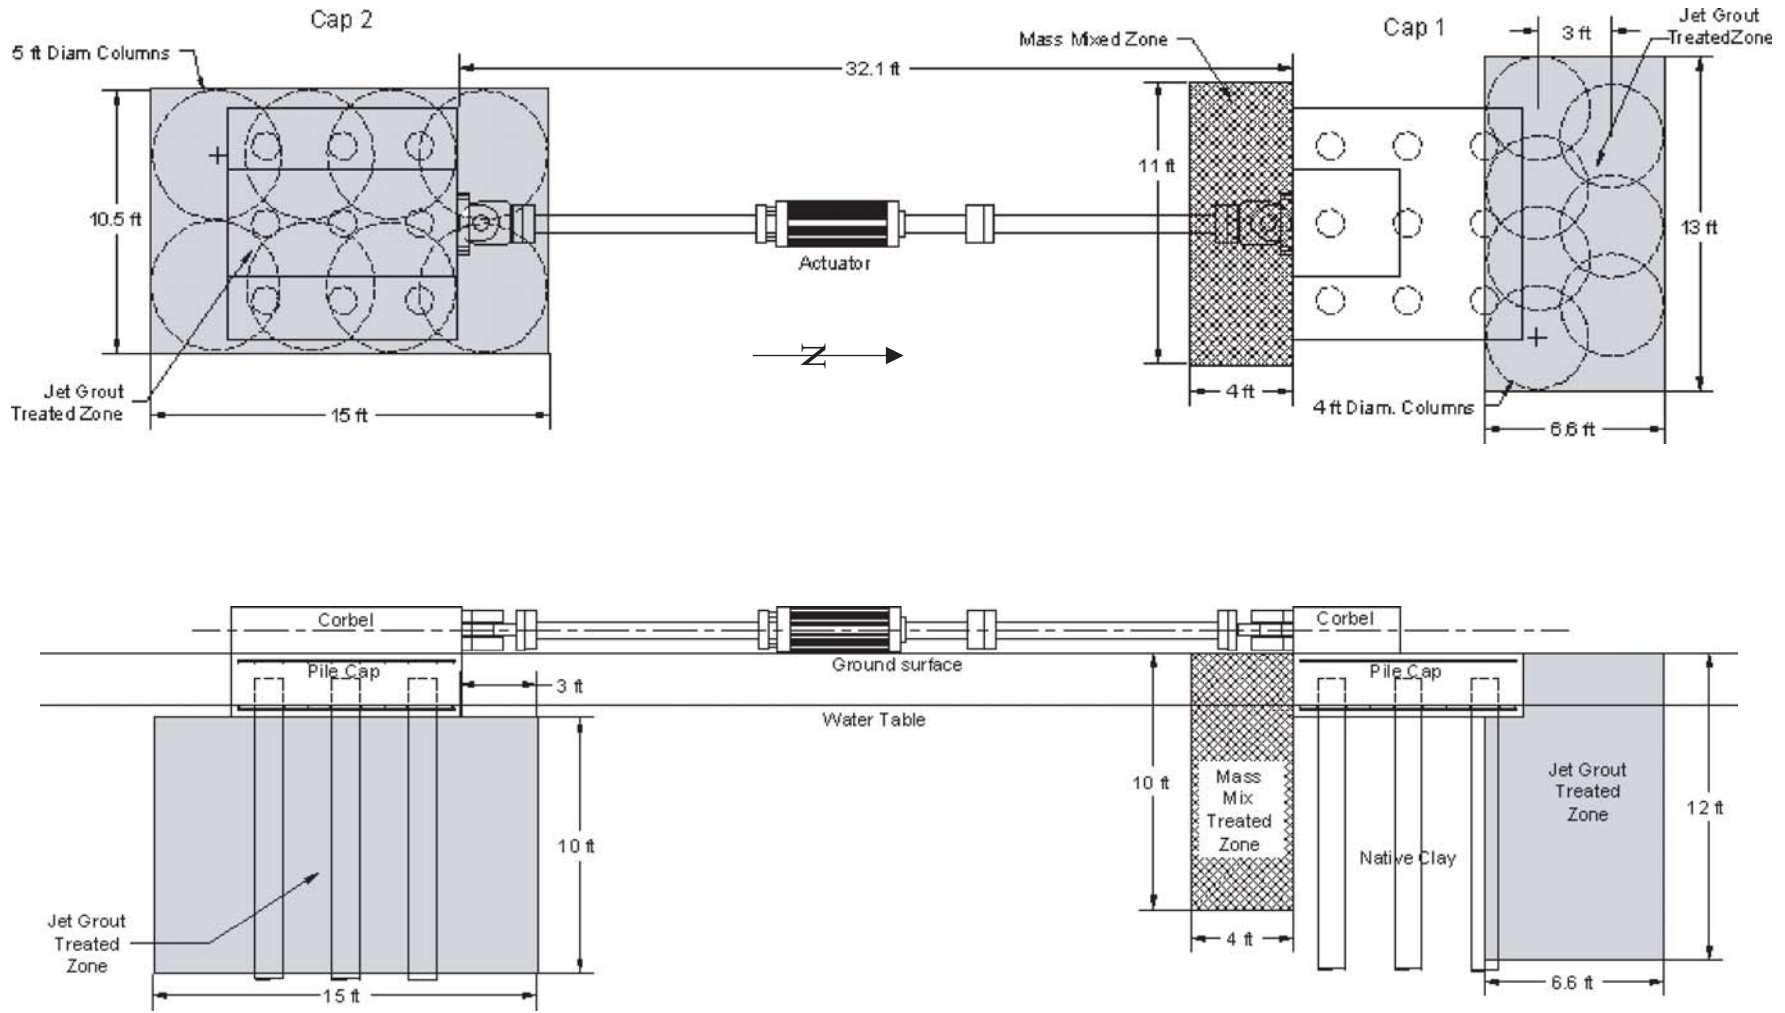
Plan and profile views of Pile Groups 1 and 2 after treatment with jet grouting.
